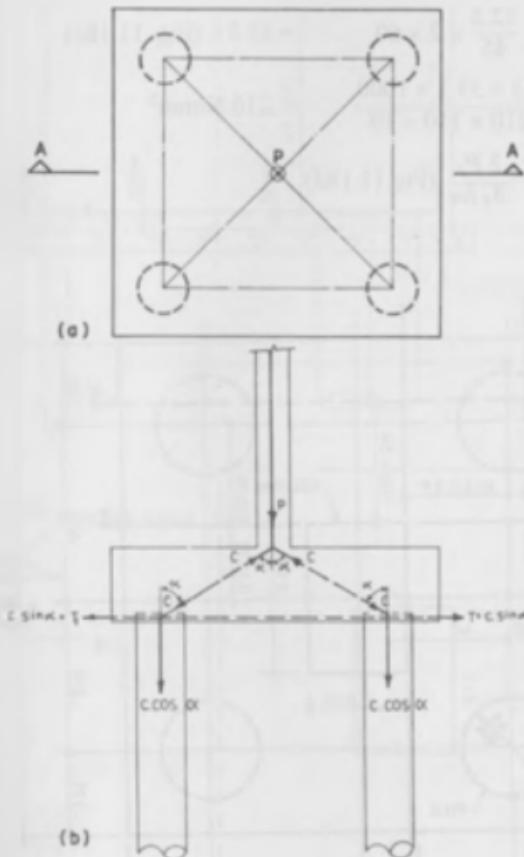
Space truss theory for pile cap design. (a) Plan of 4-piles group; (b) Section A-A.
